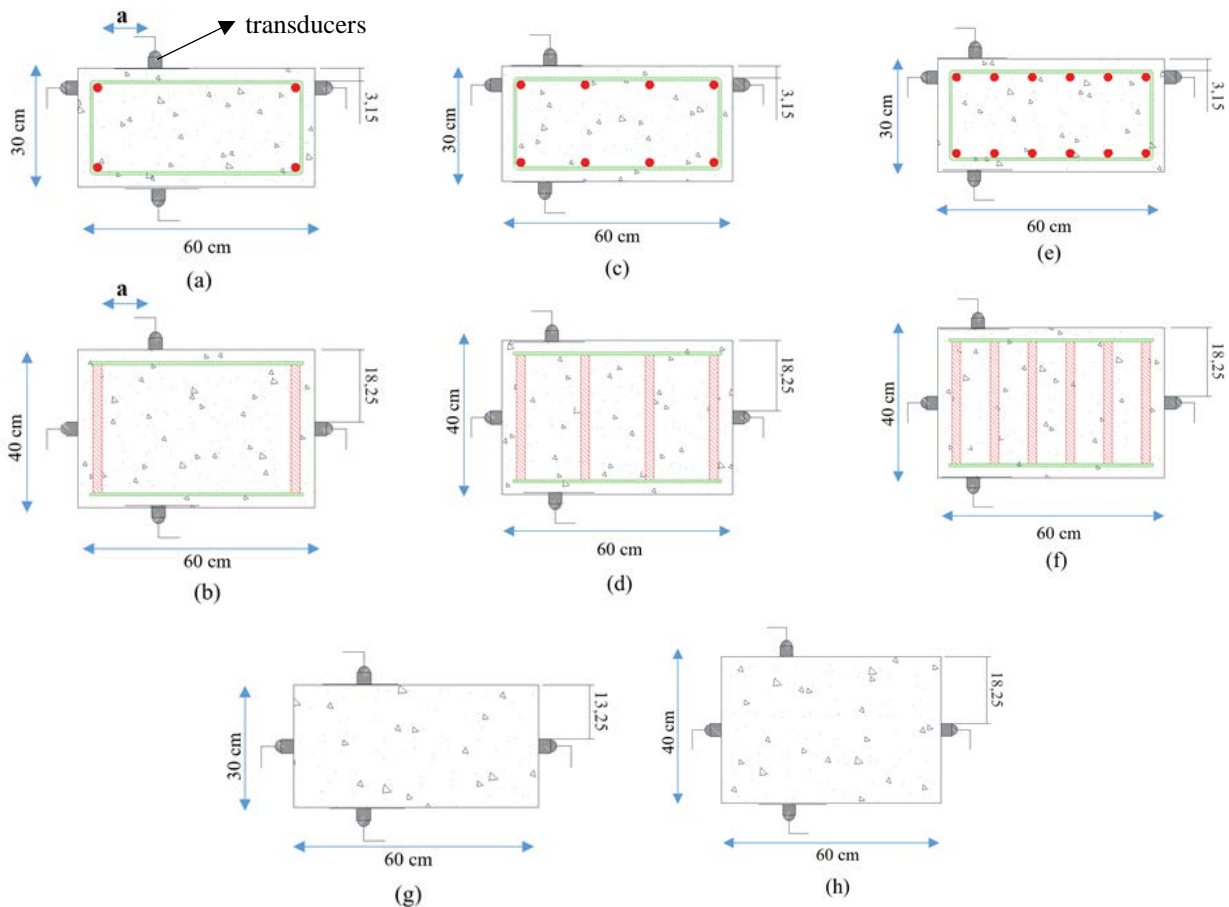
(a)-(f) Reinforced concrete; (g)-(h) unreinforced concrete
